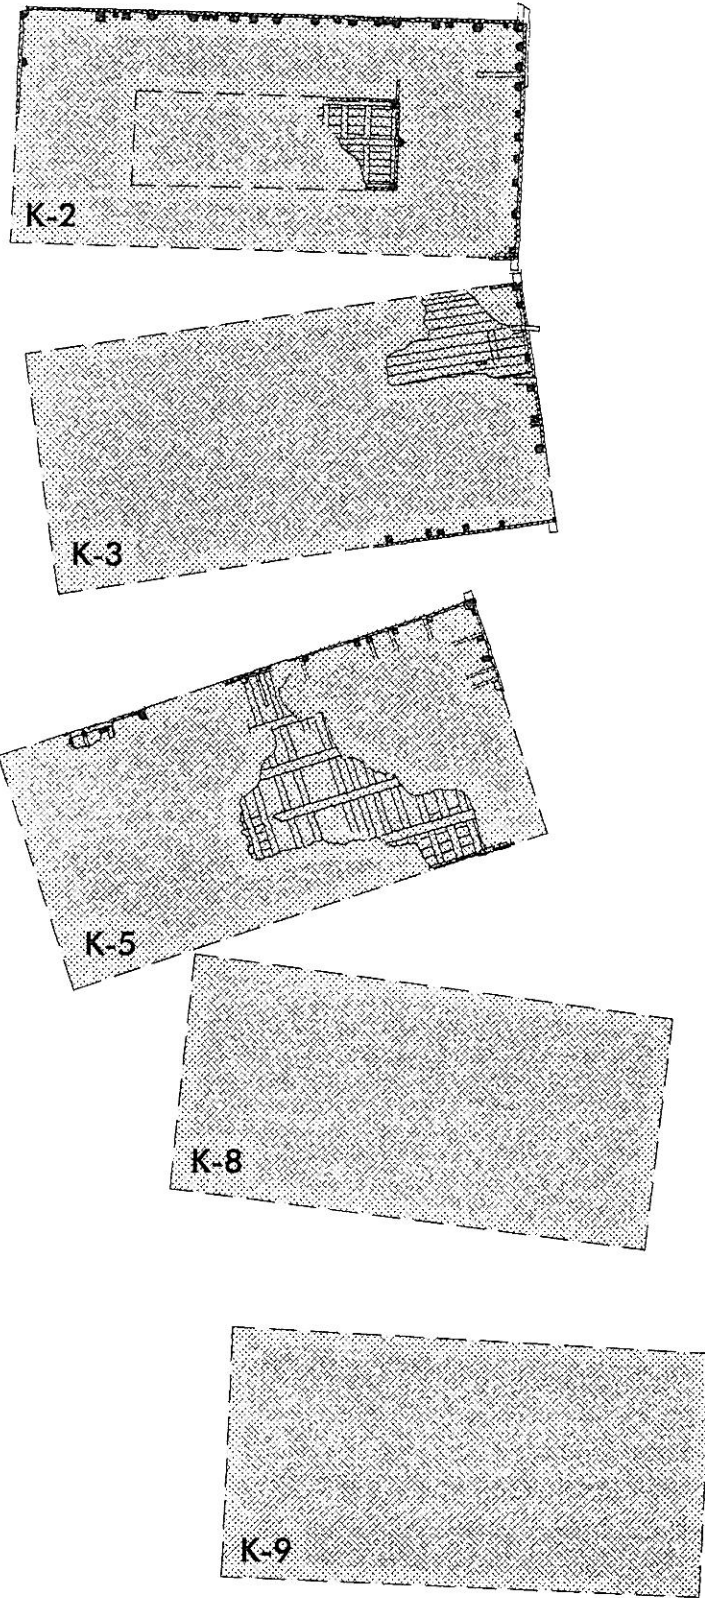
Reconstruction of area K caissons being filled with concrete and sunk (C. Brandon).
